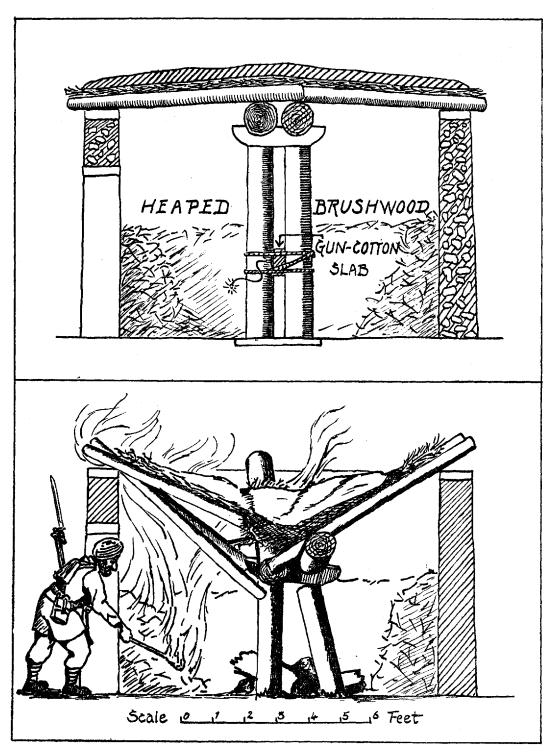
TWO STAGES IN THE DESTRUCTION OF A HOUSE WITH FLAT MUD ROOF IN WAZIRISTAN
